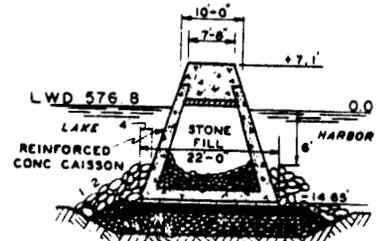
Typical pier cross sections, Waukegan Harbor, Illinois
